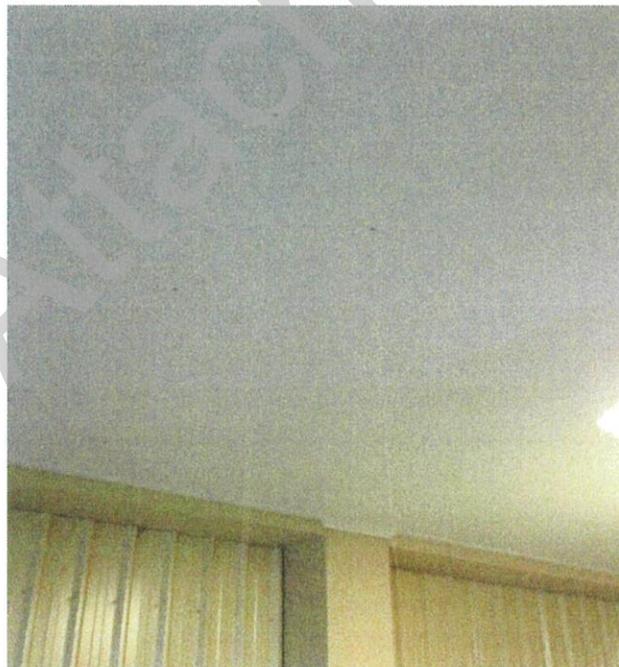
14<sup>th</sup> August 2013, Damage to the ceiling after rain
